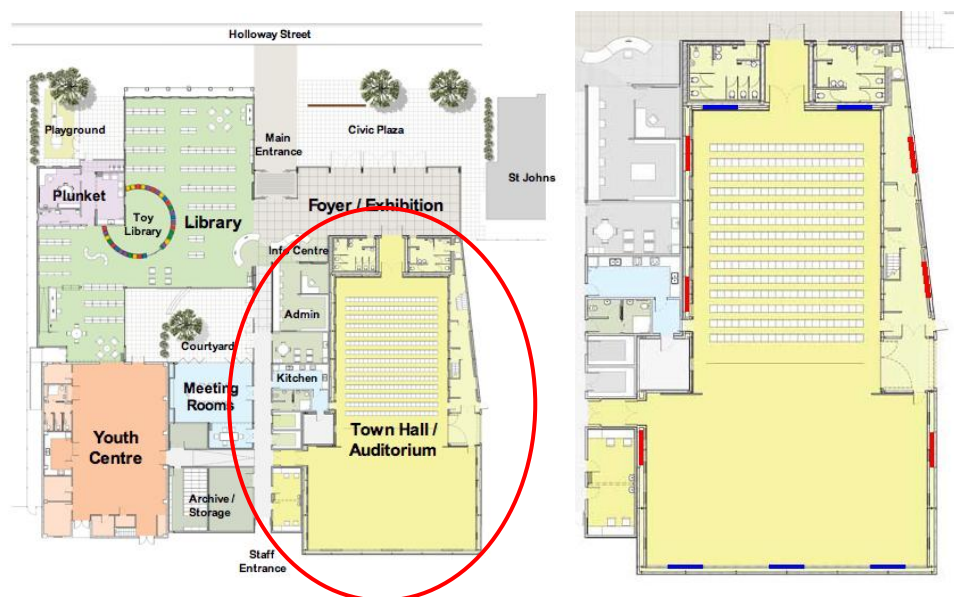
Plan of the Carterton Events Centre (left); Auditorium Plan showing walls locations (right) [1]
